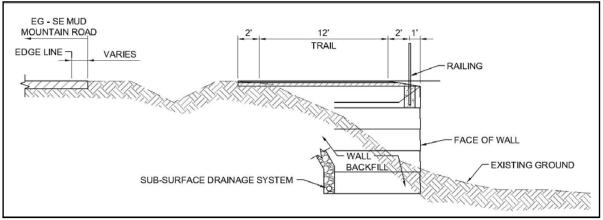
Section A - Trail South of SE Mud Mountain Road
